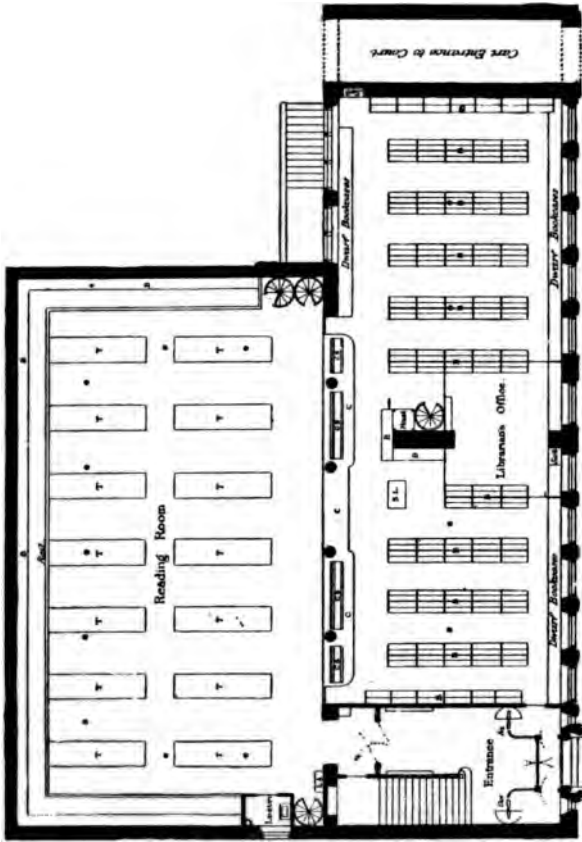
Ground floor plan of the Mitchell Library, Glasgow.
